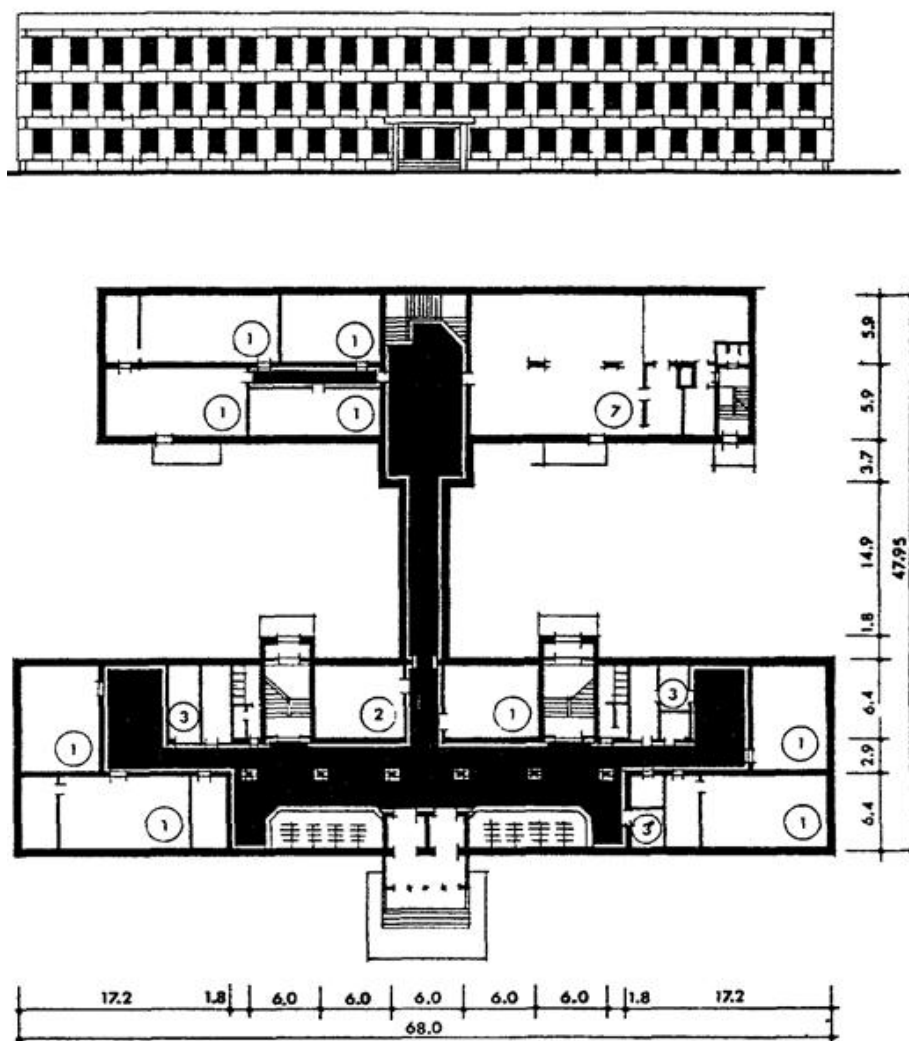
Typical project of school building 65–426/1 (*Past school buildings: typical designs, 2009*).
